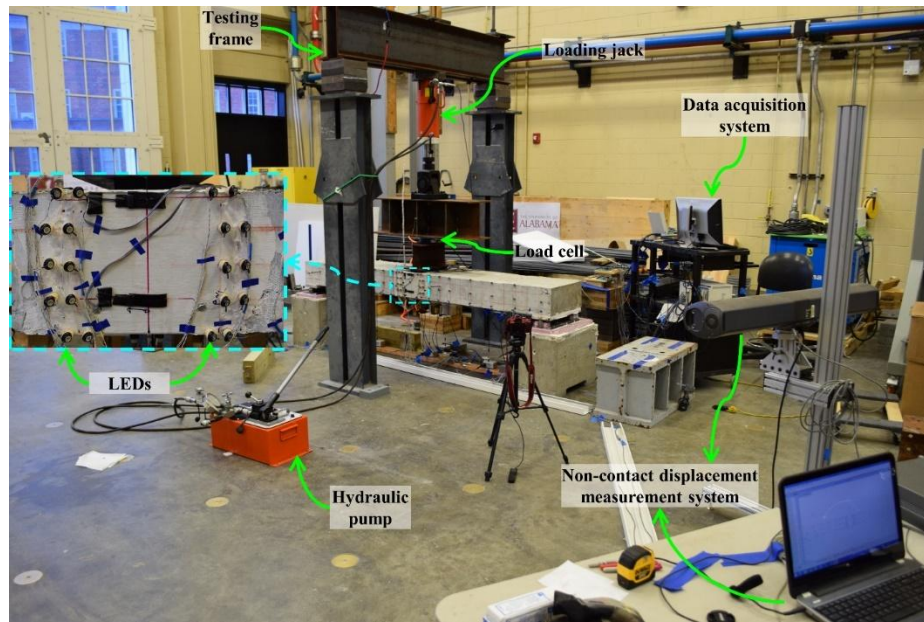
Test setup used for Test S4 for all the slab test specimens.
